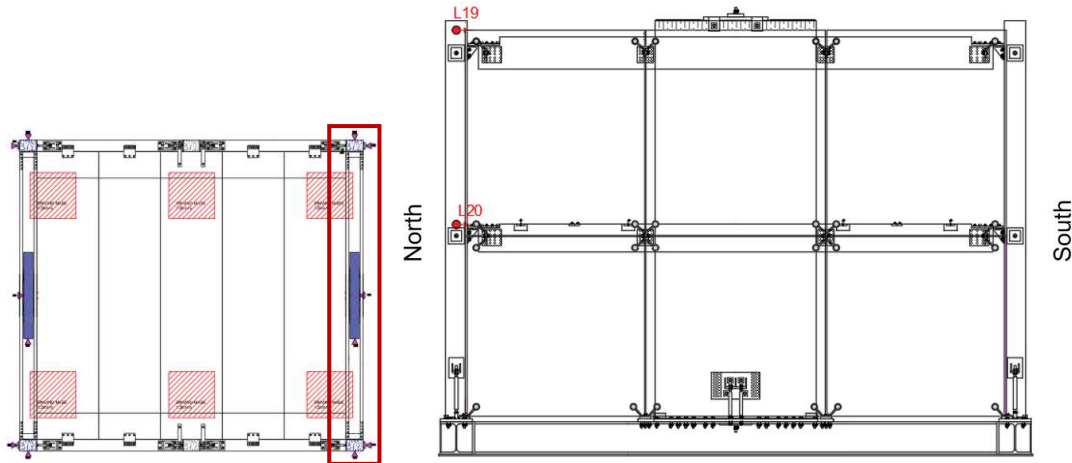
Instrumentation plan for the glass façade in the West side: schematic drawing.
